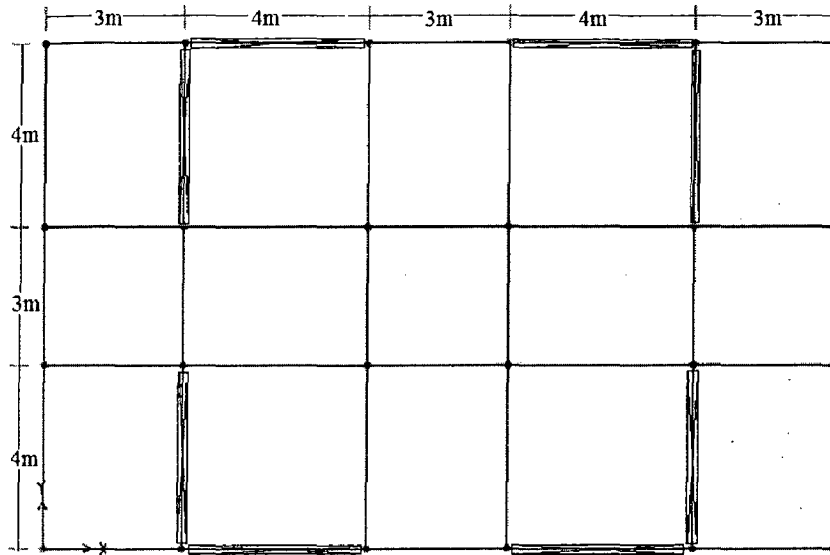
Shear link braced frame arrangement in Bldg-1
